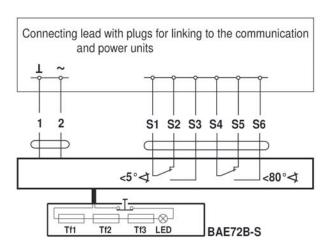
Wiring scheme of actuator BELIMO BF24-T-ST
